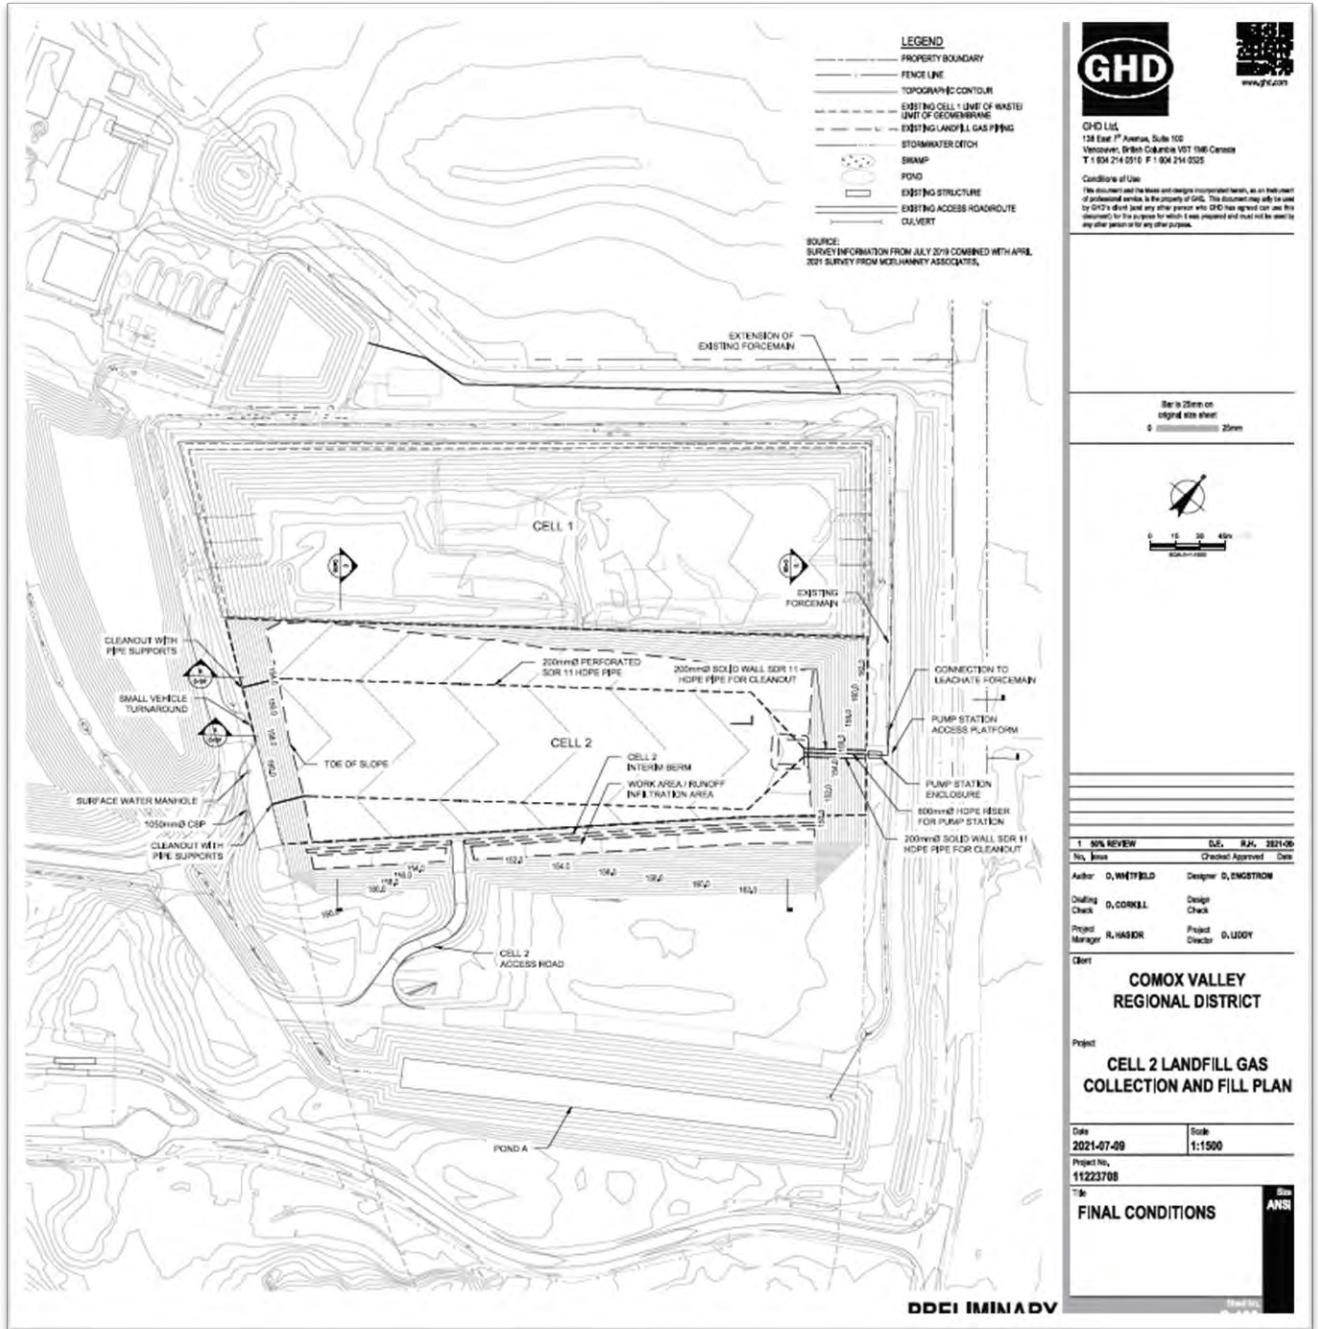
Preliminary engineering drawing of landfill cell 2 expansion.
